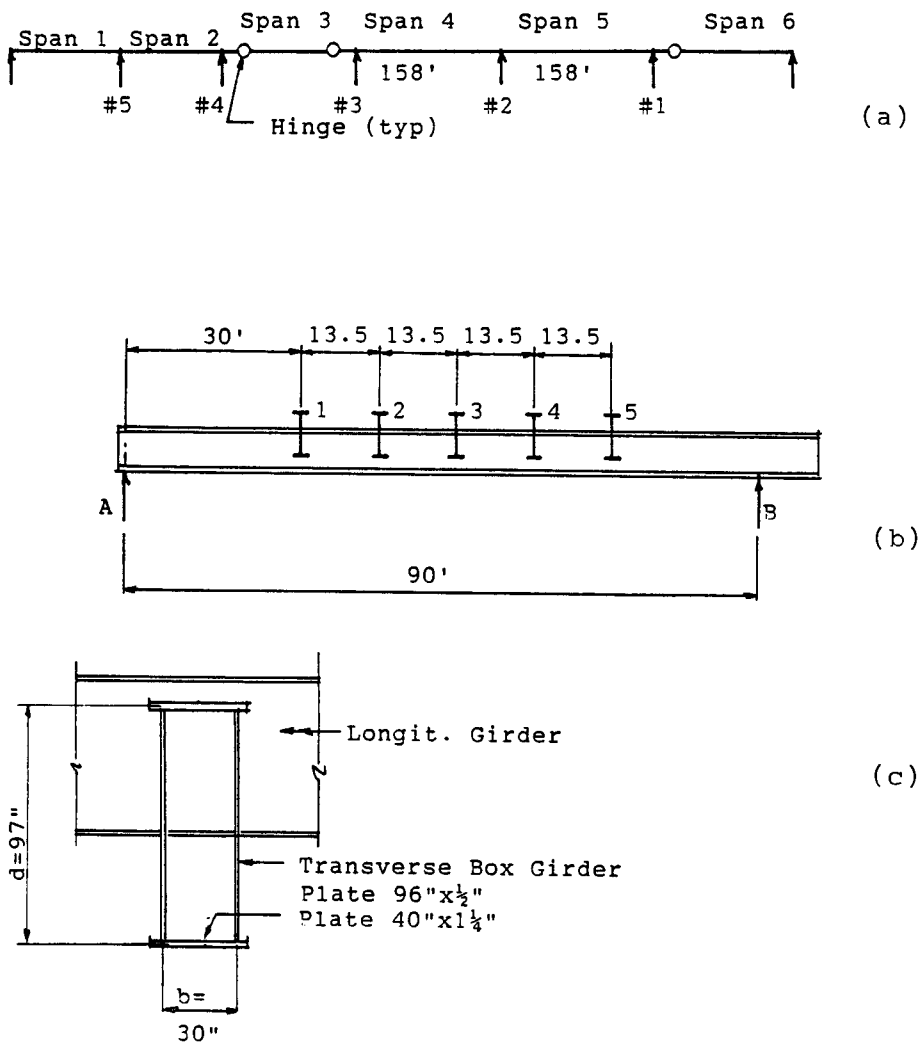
(a) Typical girder elevation, ramp C, I-75/I-275, four level interchange; (b) box girder elevation at pier 3; (c) box girder section.
